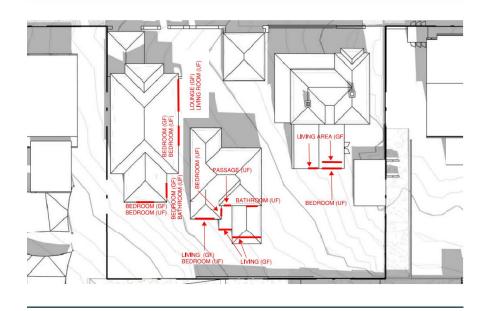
Location of living rooms of three Ben Boyd Road properties (Source: John Staff)
